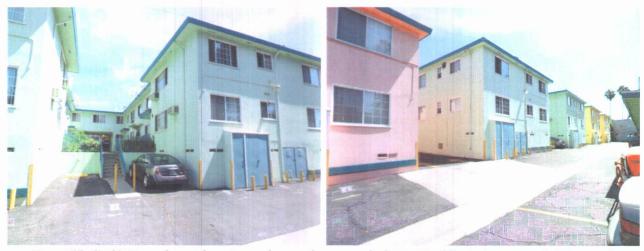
(Left) View of rear elevation and central courtyard of green Building, view to north (ESA 2015) Figure 56. (Right) Rear and west elevations of green Building, view to northeast (ESA 2015)
